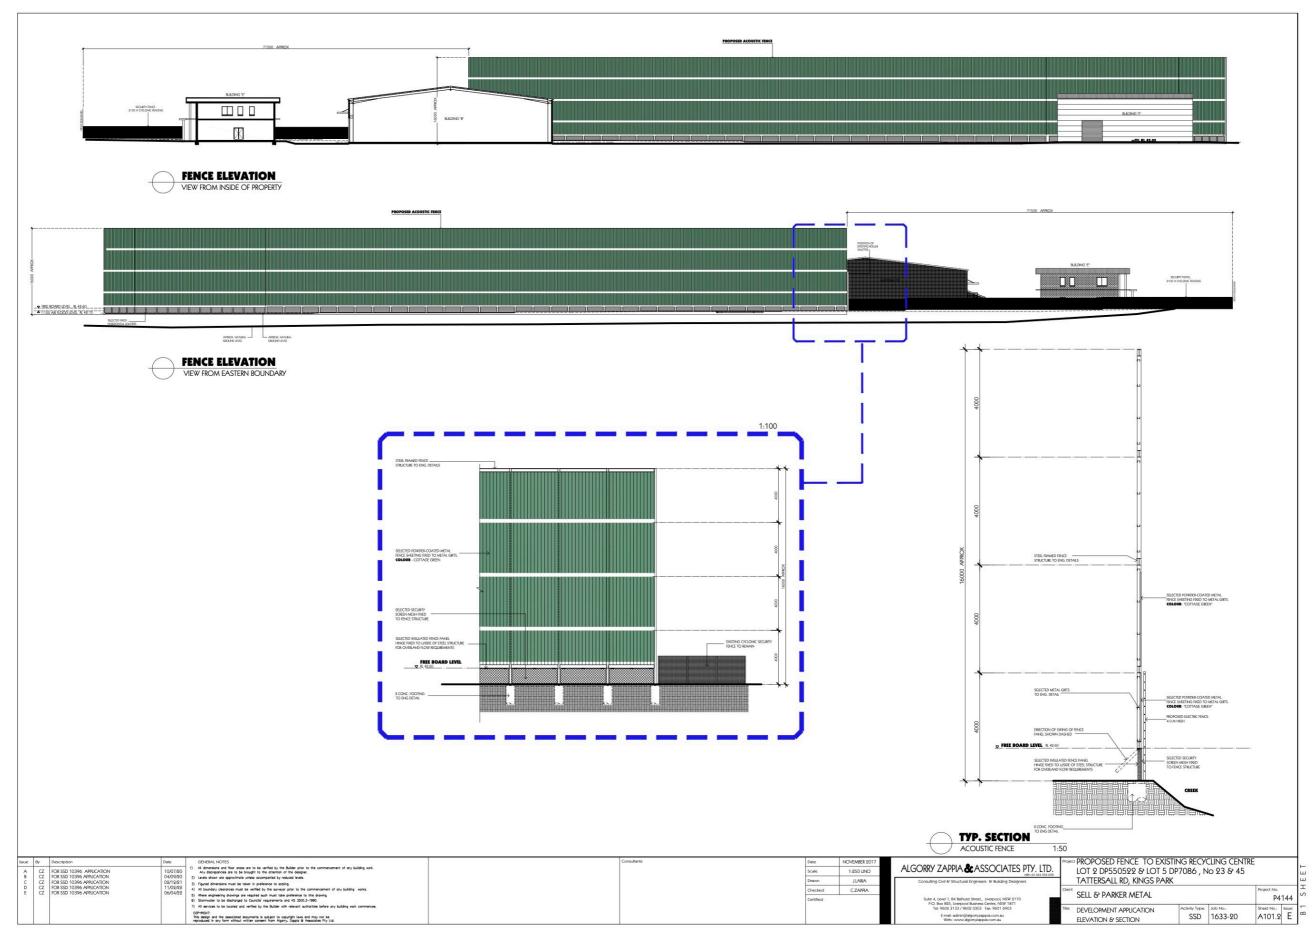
Proposed acoustic fence - elevations and typical construction section
